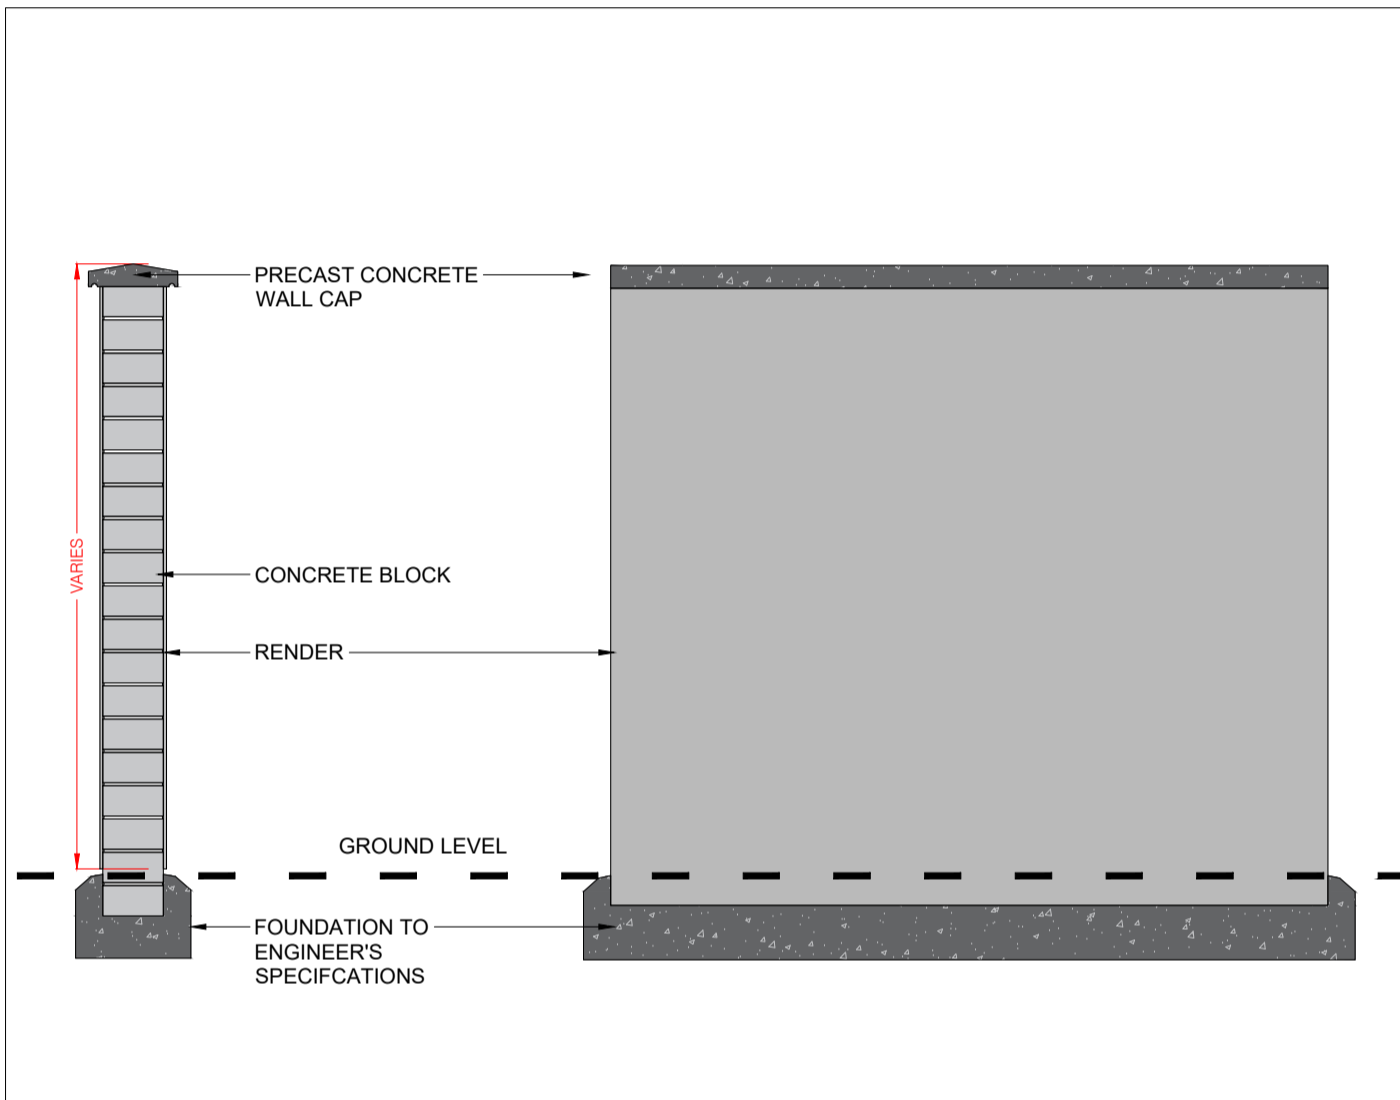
2M HIGH STONE FACED CONCRETE BLOCK WALL WITH CONCRETE CAPPING
